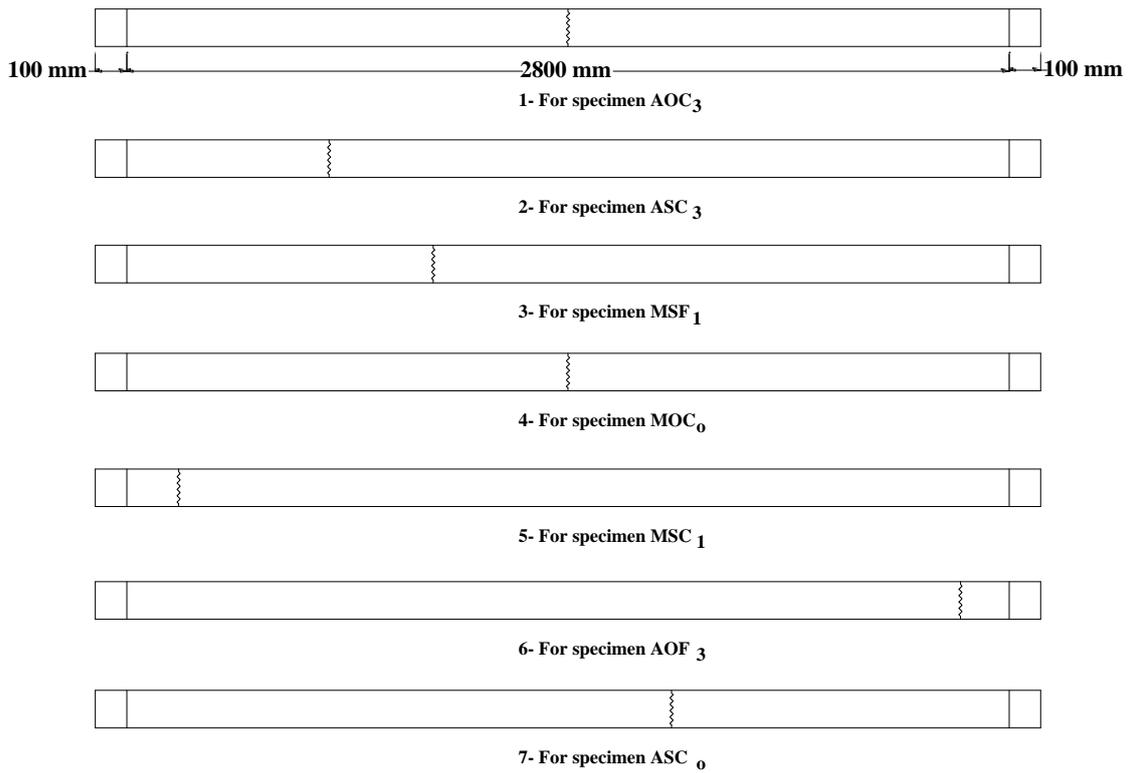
Location of cracks for some concrete beam specimens.
